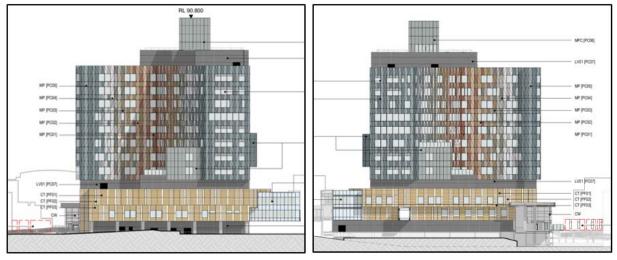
| PSB north-west elevation (left) and south-east elevation (right) (Source: Applicant's RtS)
